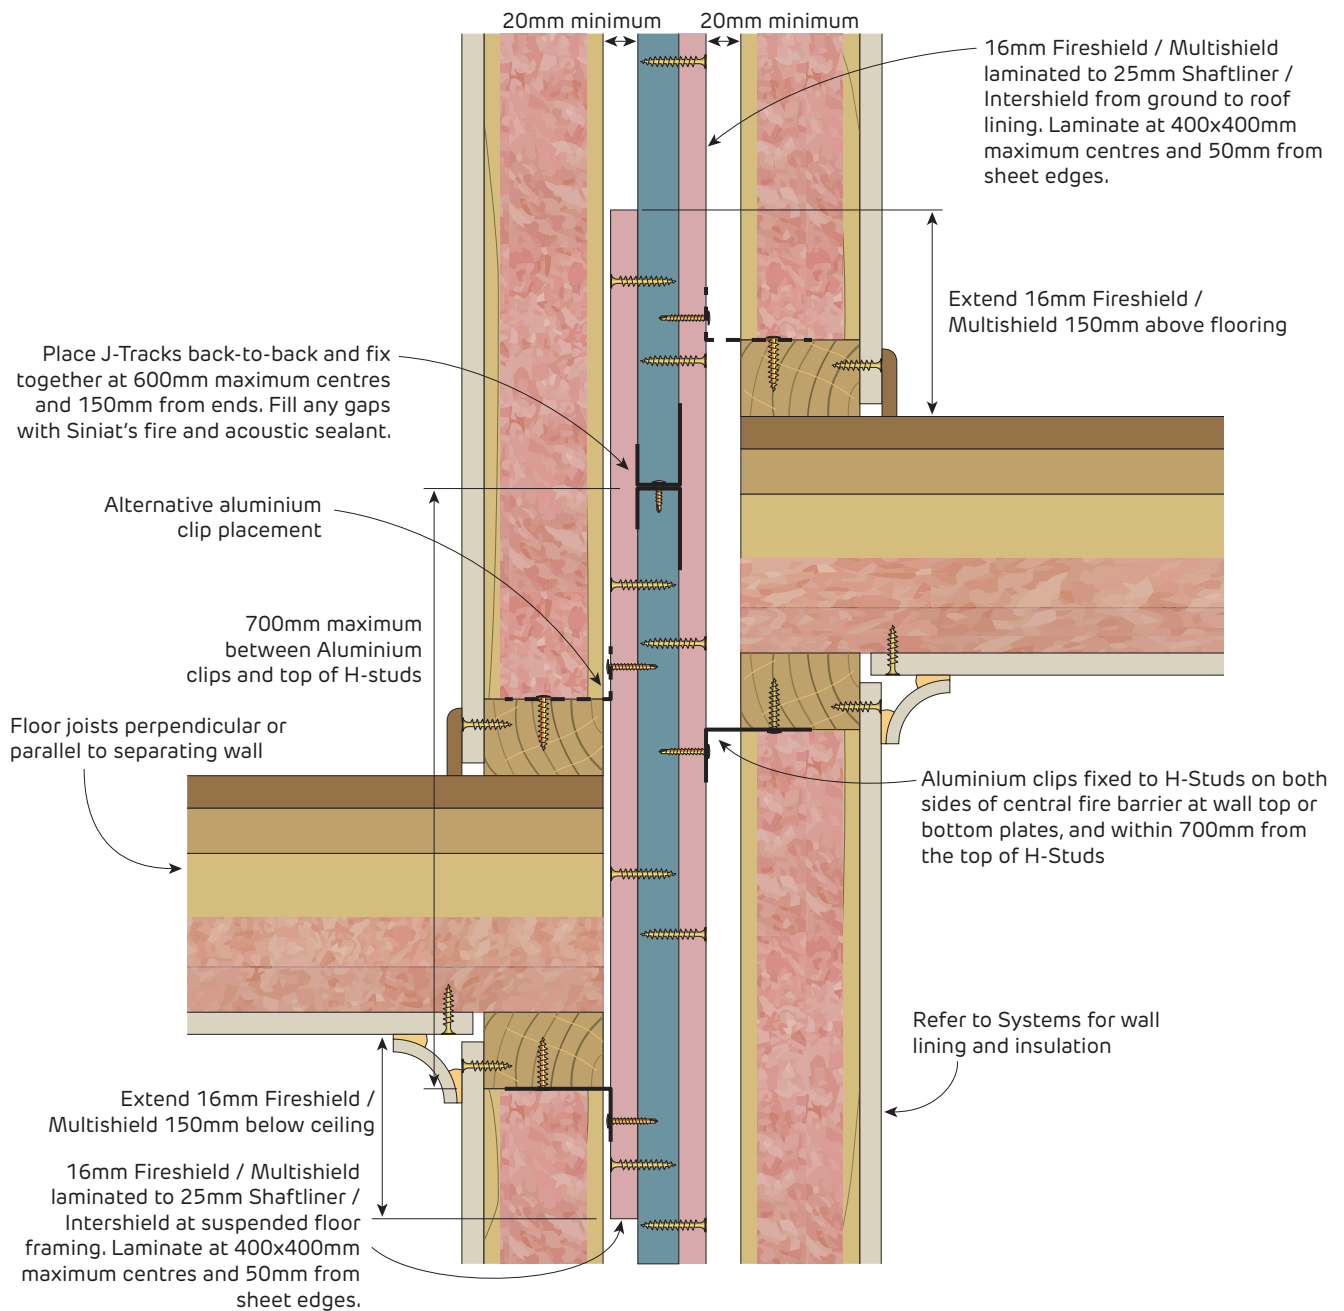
Interhome Wall to Upper Storey Staggered Floor
